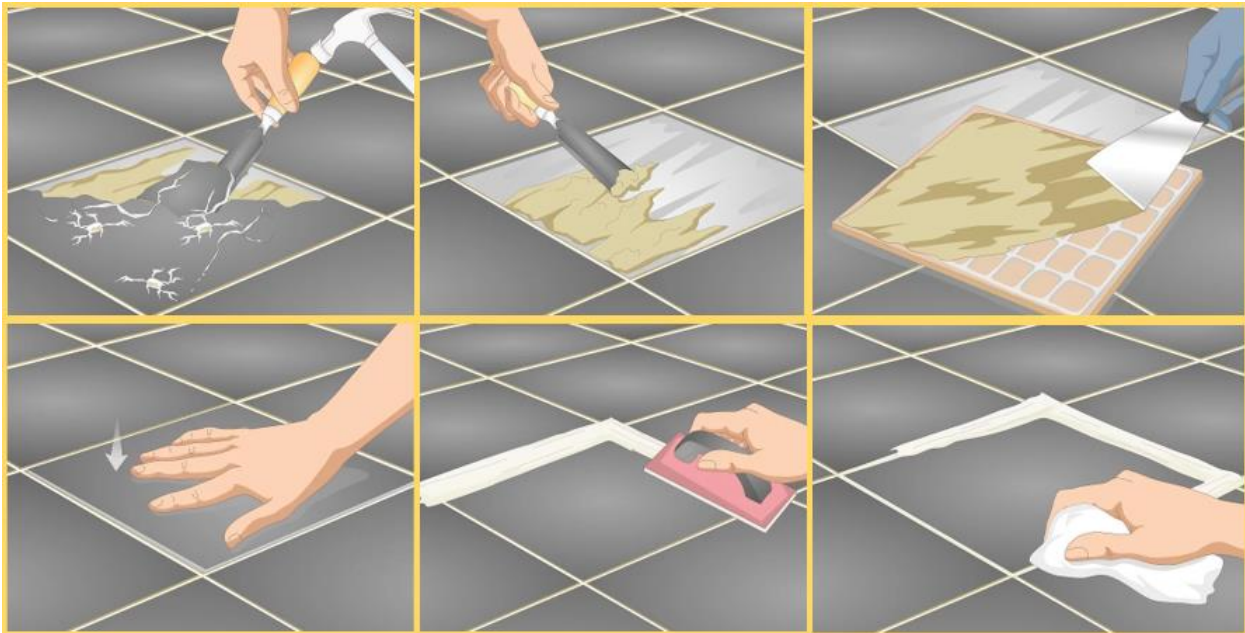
How to Repair Cracked Floor Tiles. Frickie, Art, and Eric McClure. How to Repair Cracked Floor Tiles, wikiHow, -6 June 2023, www.wikihow.com/Repair-Cracked-Floor-Tiles.
